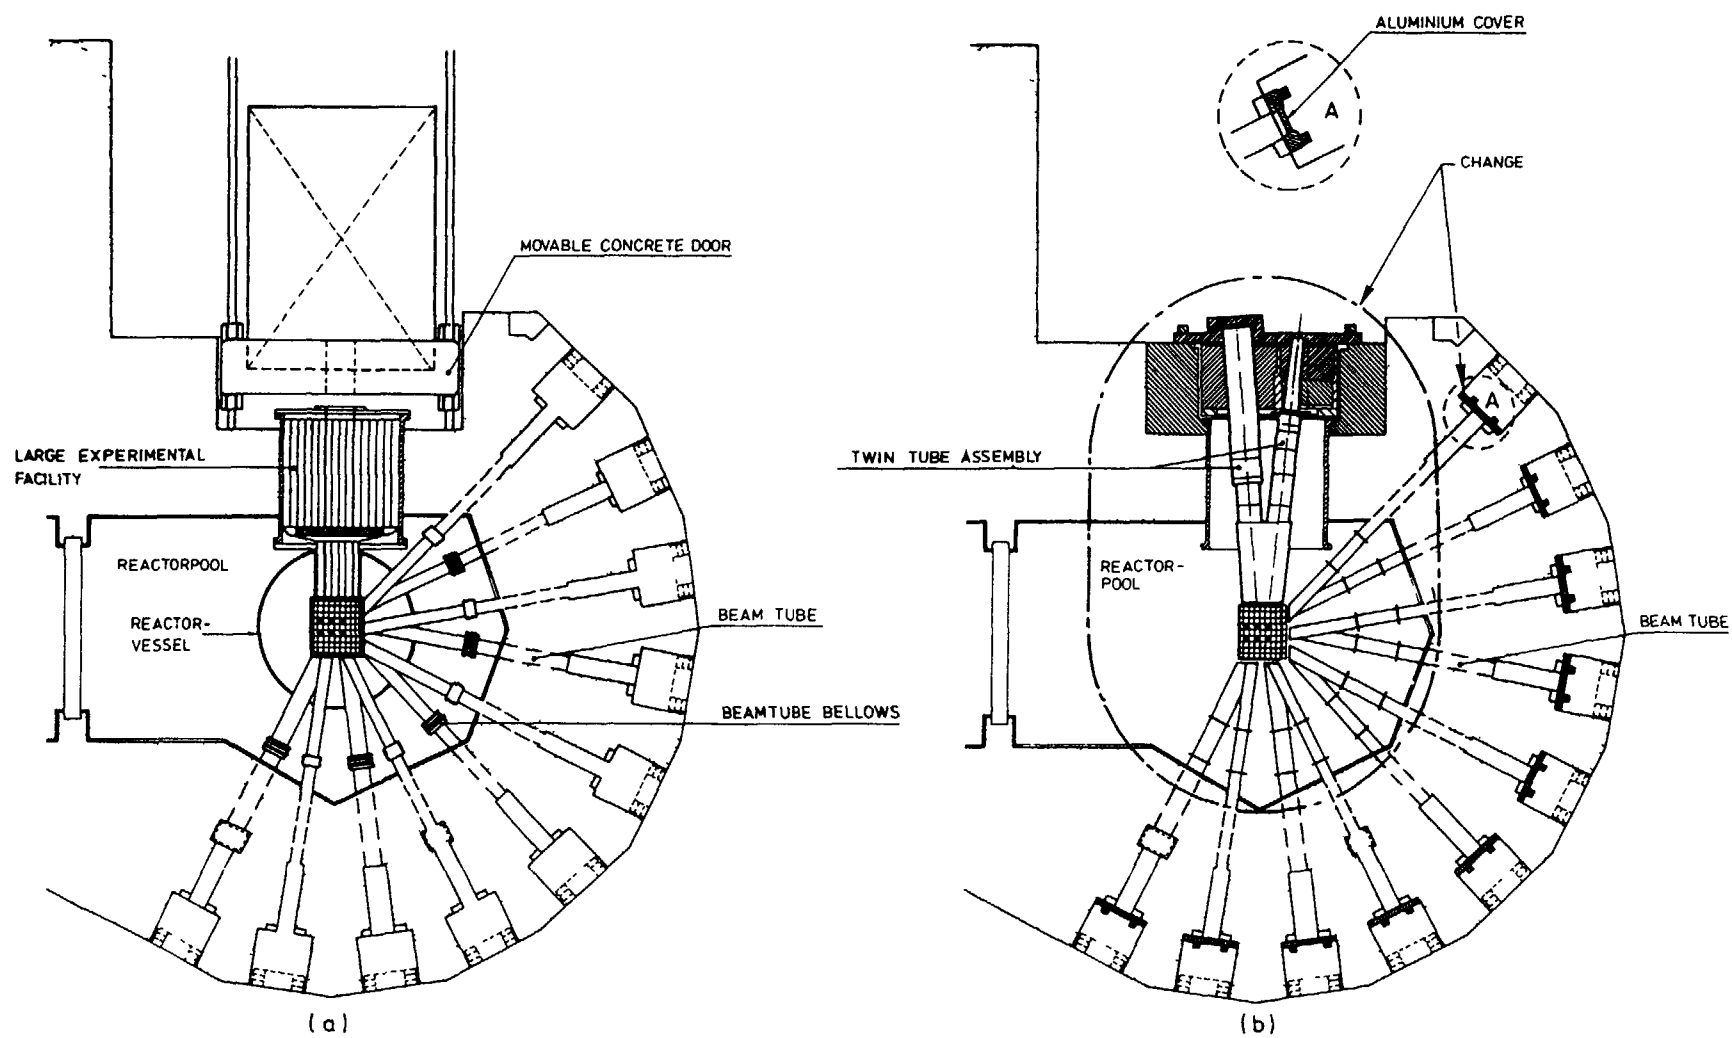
Schematic horizontal cross-section through reactor vessel and beam tubes: (a) original design; (b) improved design.
